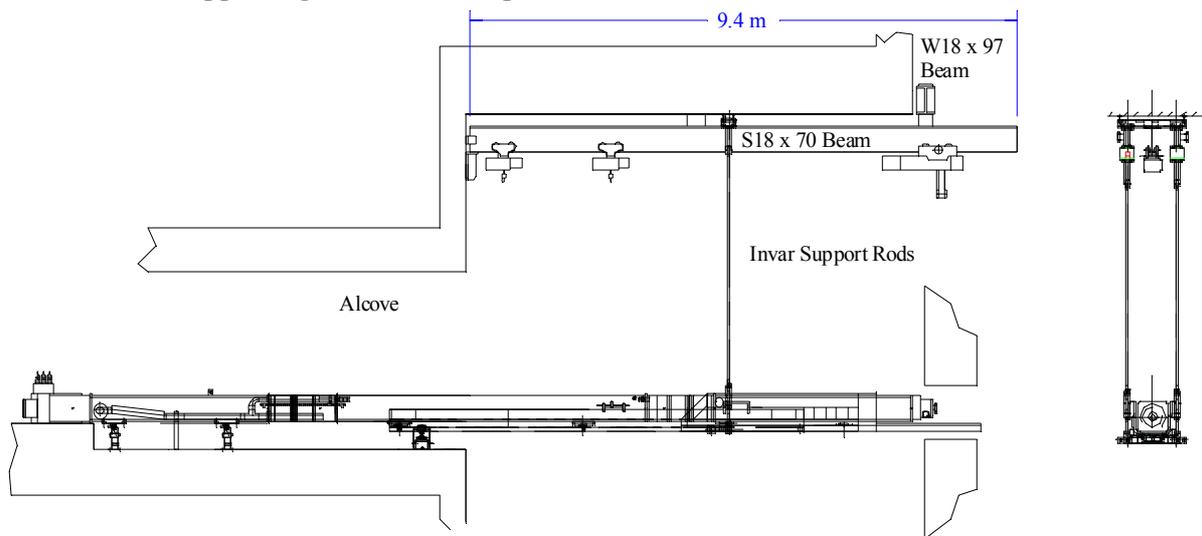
Elevation view of low beta system with overhead supporting structure at A4.
